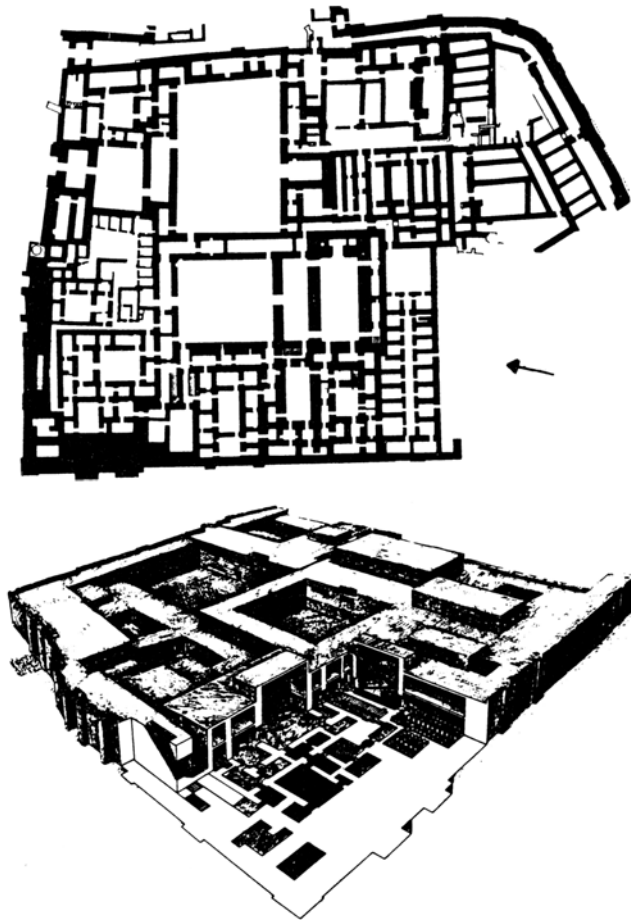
Royal palace of Mari: plan and reconstruction.
